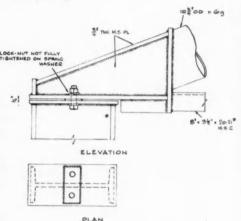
Truss bearing—'G' Shed. (150-ft. Span bowstring truss)
